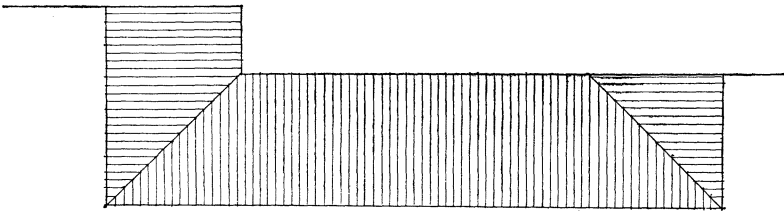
PLAN OF ROOF OF EAST STOA.
